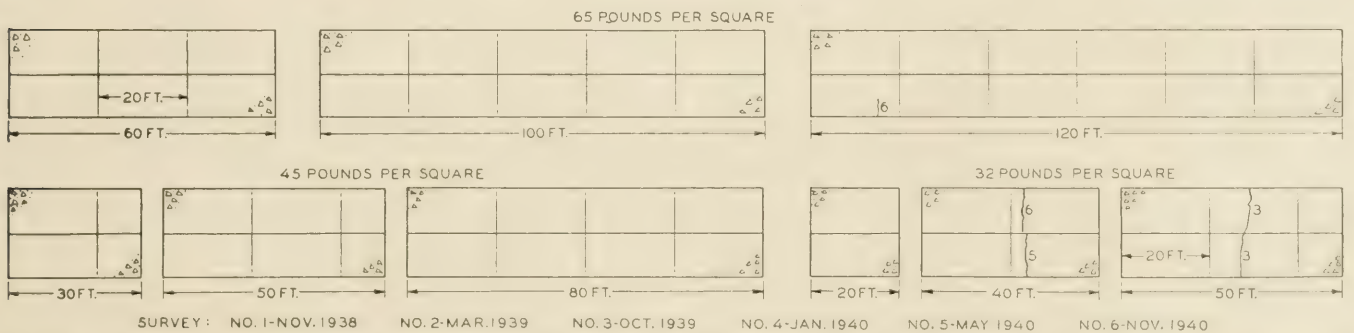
TYPICAL CRACK SURVEY SHEET FOR SHORT SECTIONS REINFORCED WITH WELDED FABRIC; SECTIONS PLACED SEPTEMBER-OCTOBER, 1938.
